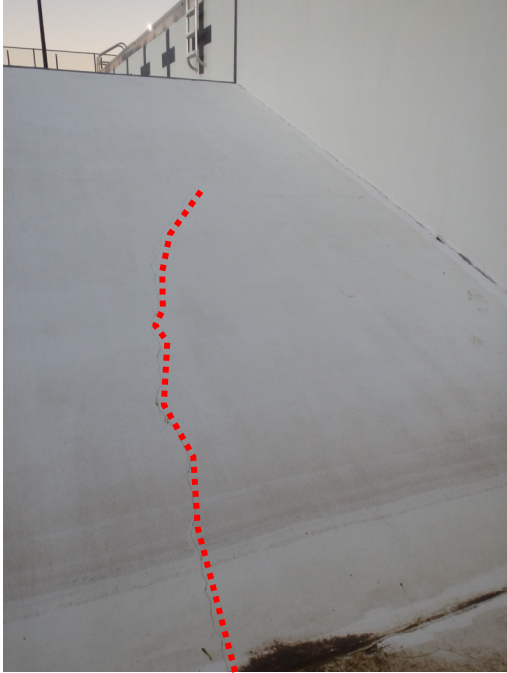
Slab expansion joint in the zero-entry area that is distorted and found to leak by BAI.
